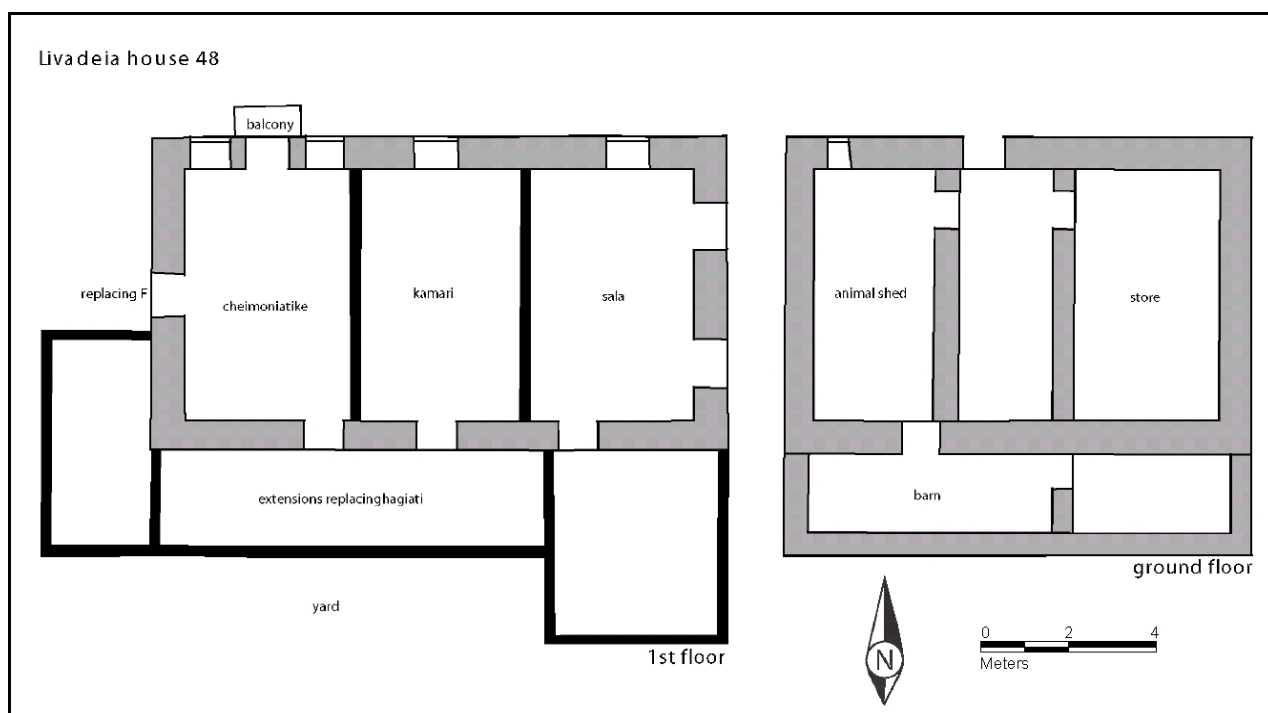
Plan of the 1½-storey house 48 in Livadeia.
